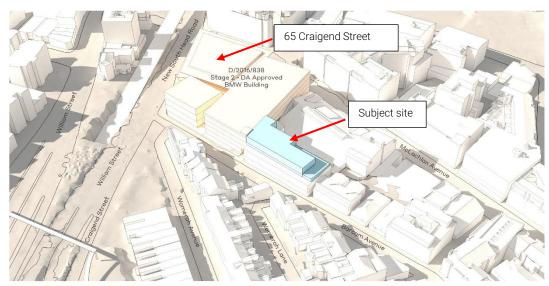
3D view of the proposed building envelope shaded in blue, in its surrounding context. Note the surrounding large-scale development further northeast. The DA approved 4 storey BMW building is shaded in yellow (Source: Ethos Urban, Urban Design Report & Concept Design, Issue A, April 2018).
